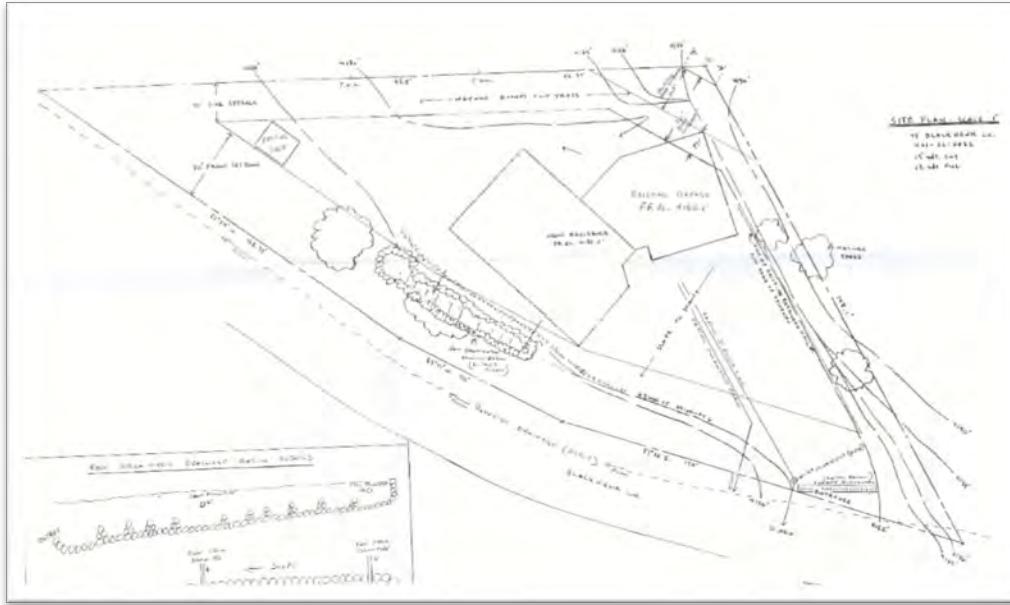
Site plan provided by applicant depicting property setbacks and location of proposed residence
